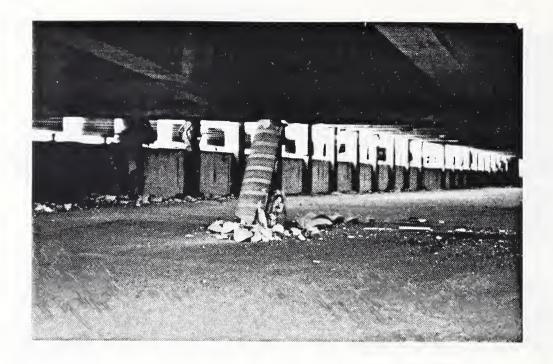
Non-ductile failure of a concrete column in the garage structure.
